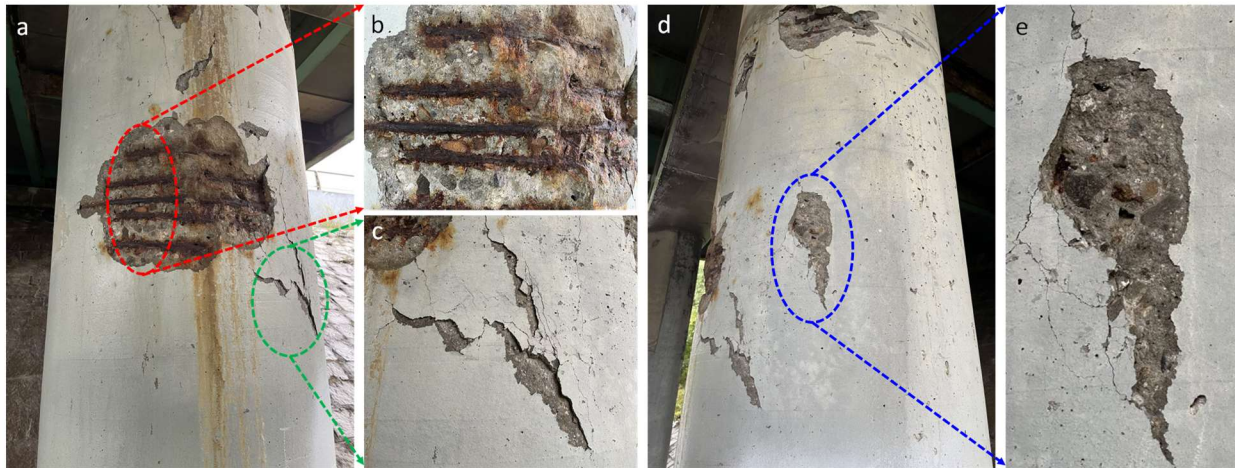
(a) E3 column of the bridge, (b) Sample 1 collected from the corroded rebar area, (c) Sample 2 collected from pier surface, (d, e) Sample 3 collected under surface.
